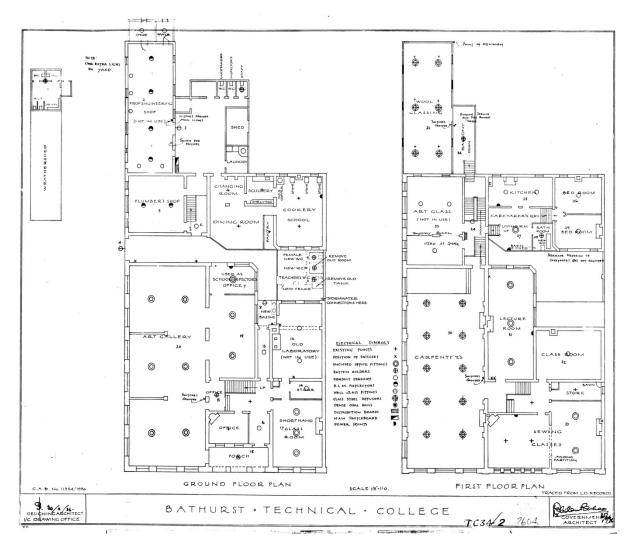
Part 3: Public works drawing of the TAFE electrical layout 1936
